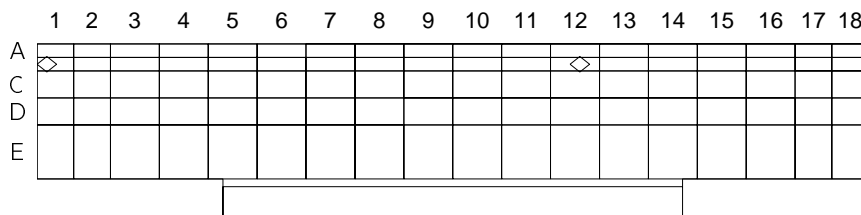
Façade sections on the west façade of the Main Building, with section numbering. The diamonds indicate the measurement positions of the full-scale experiment; position P6 is in façade section B1, and position P4/5 in B12. See also figure 3.6.
